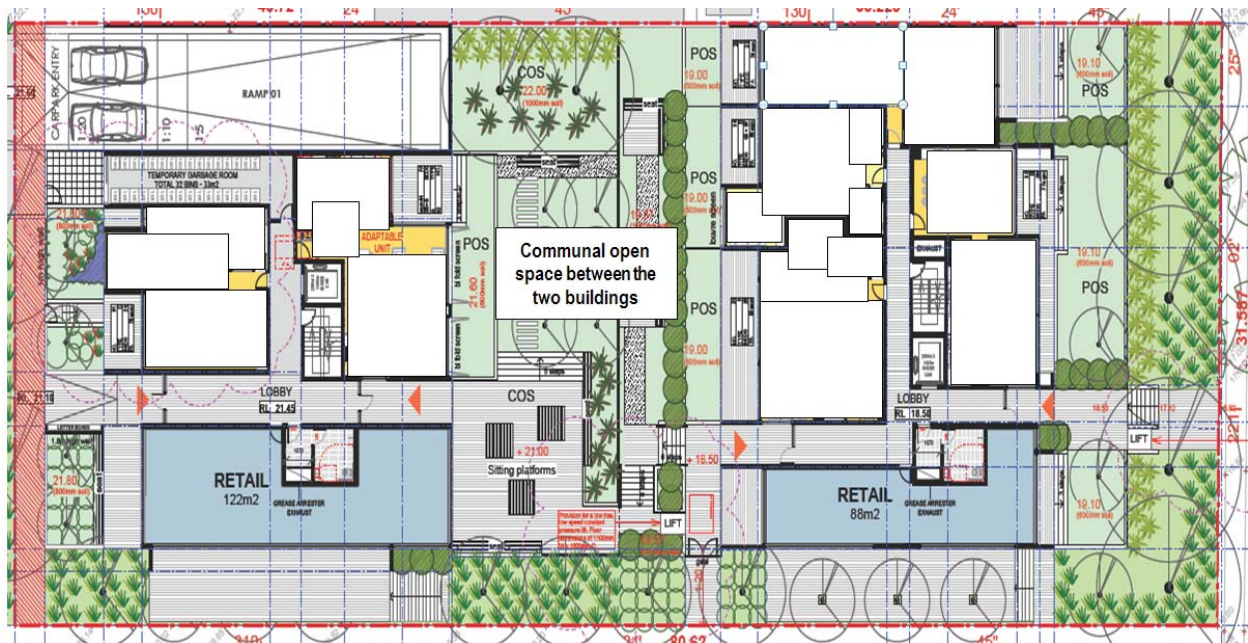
The Communal Open Space located between the two buildings, with access from both buildings.
